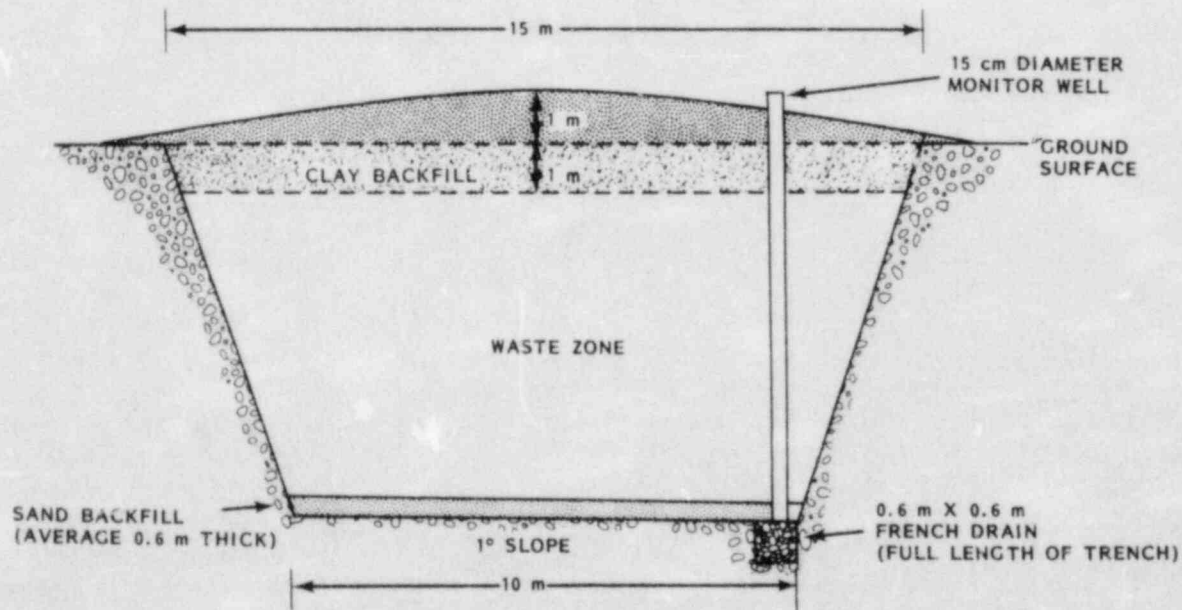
Cross Section View of the Reference Eastern CLLW Site Trench
